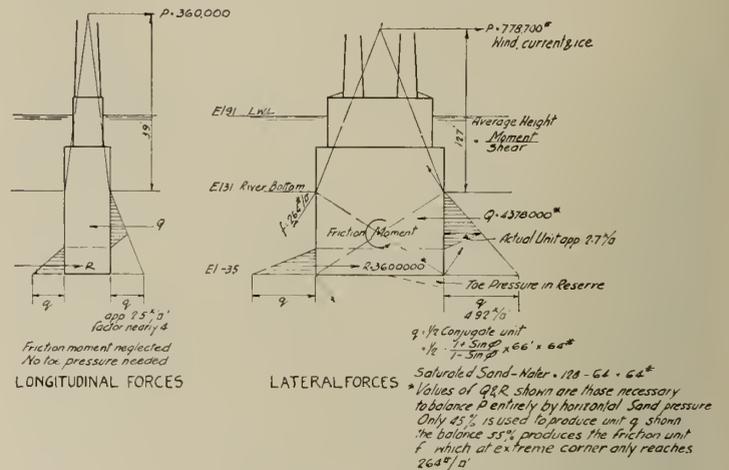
Study of Pier No. 3, Lateral and Longitudinal Forces.
